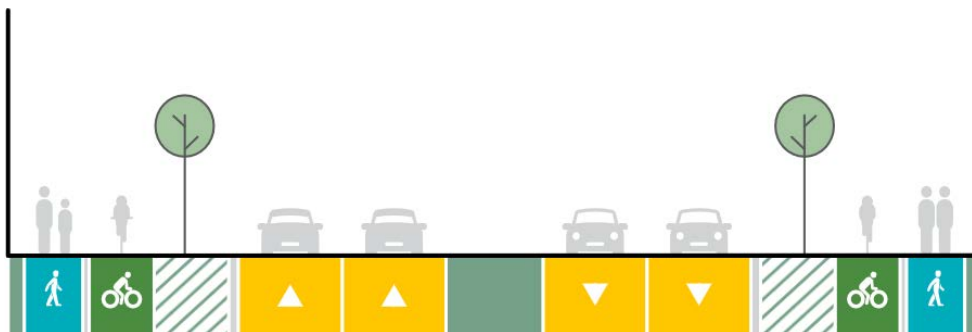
CFAF Outcome – Access Road indicative 30m cross section
